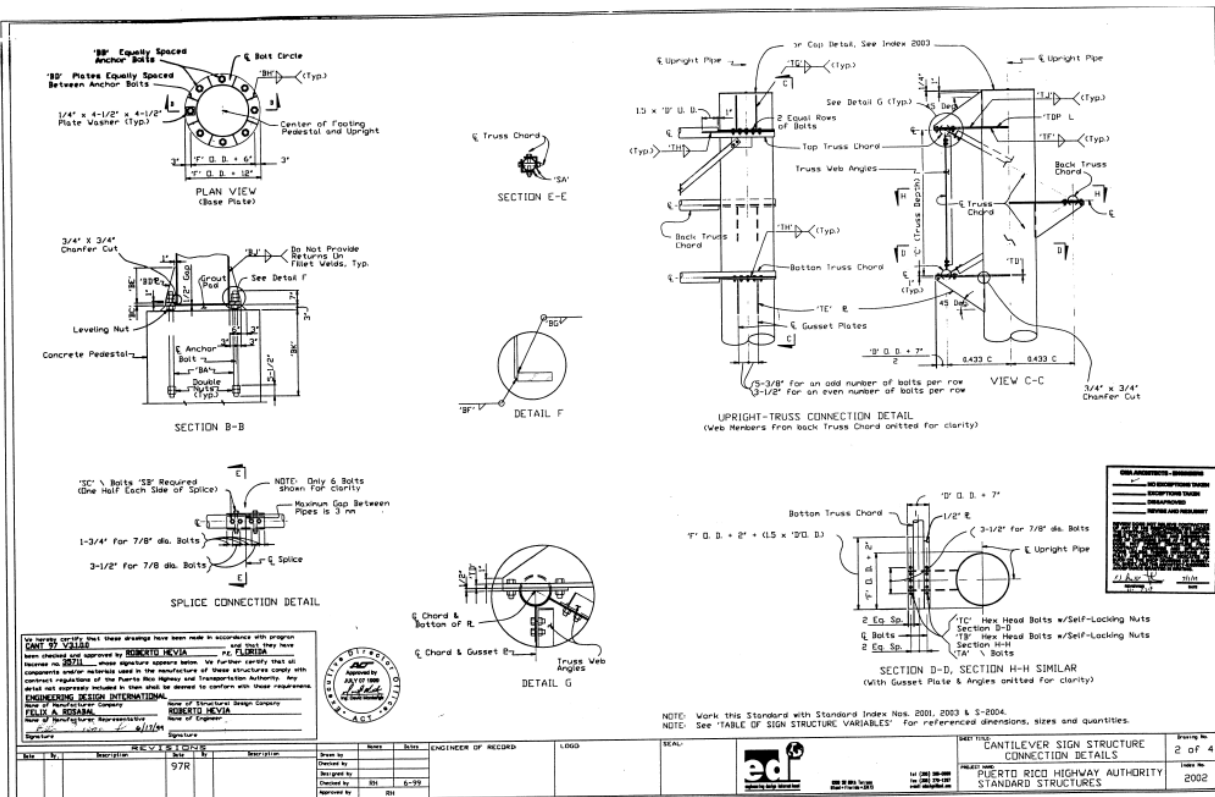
Overhead Cantilever Traffic Sign Structure Connection Details (PRHTA, 2010)
